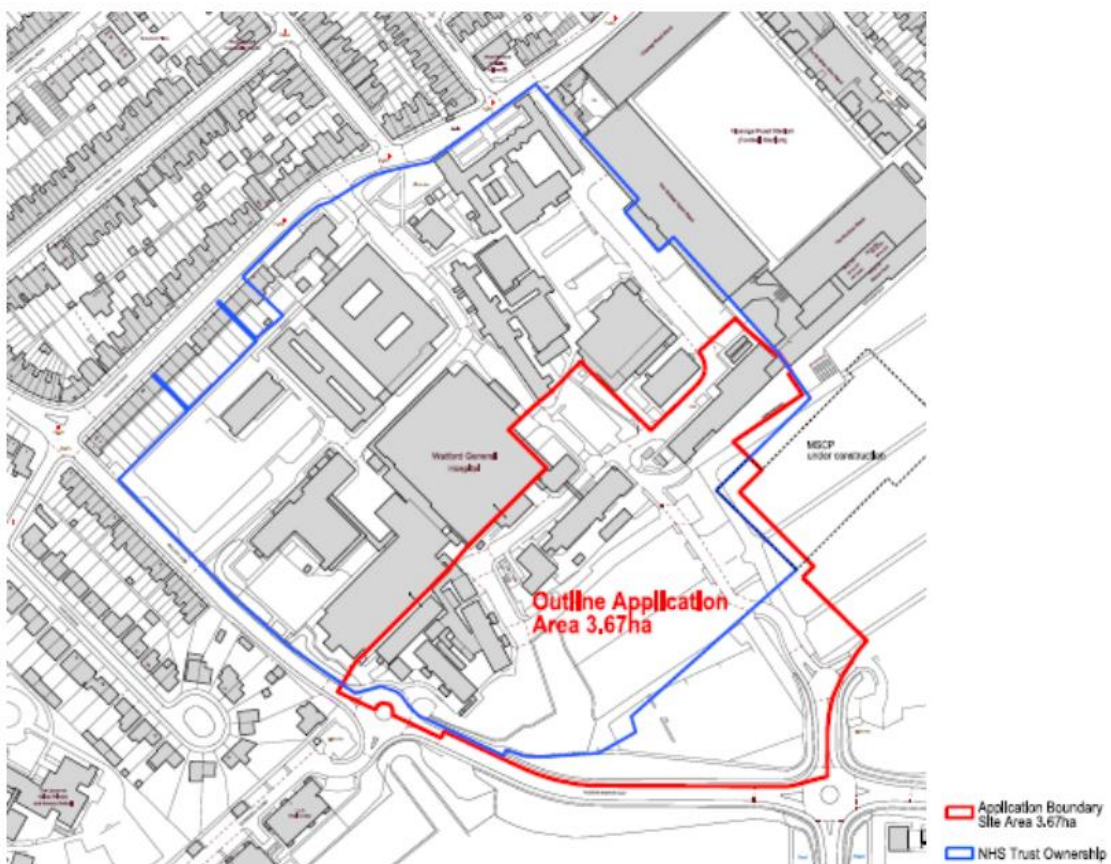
Application site boundary (Figure 2.1 of Planning Statement)
